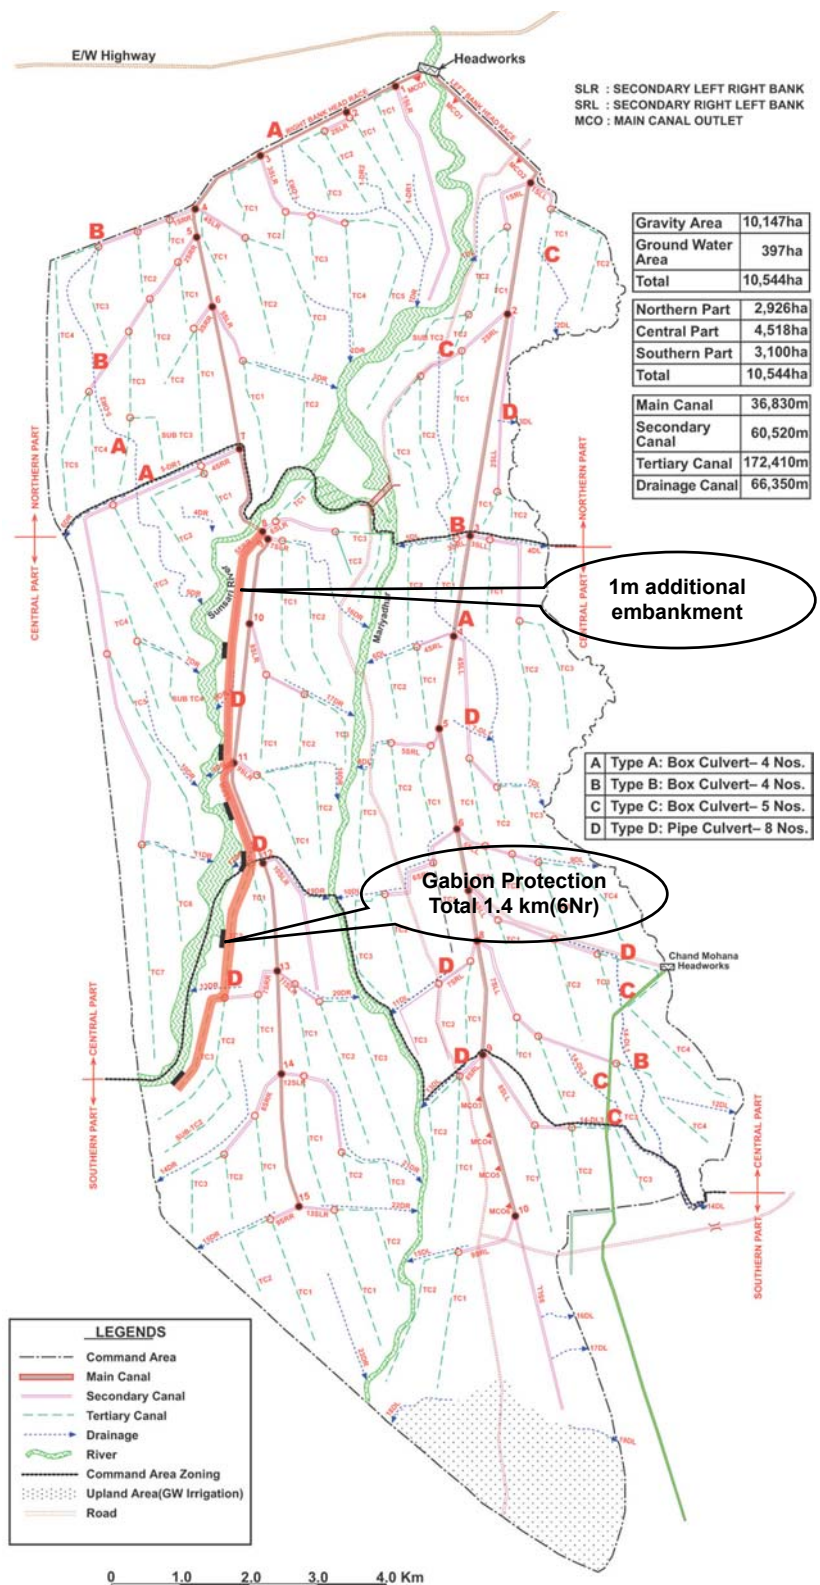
Proposed flood Protection and Crossing Drainage
